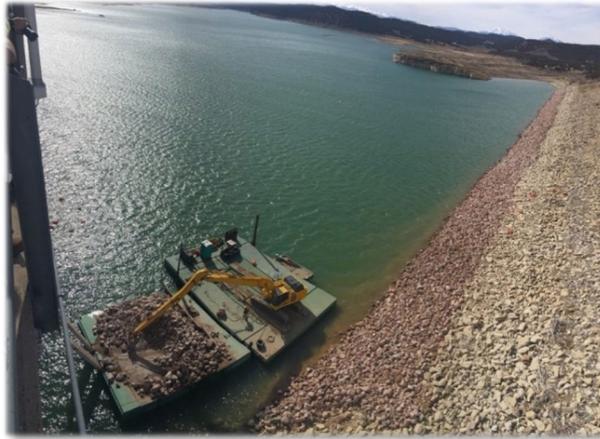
Barges and excavator being used to transport and place riprap on upstream slope.
